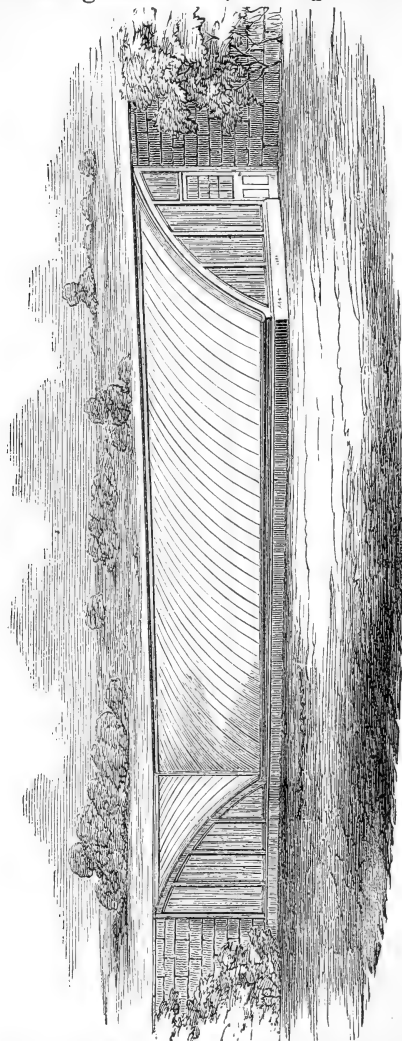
SINGLE-ROOF HOUSE AGAINST A WALL (From Woodward's Graperies).
